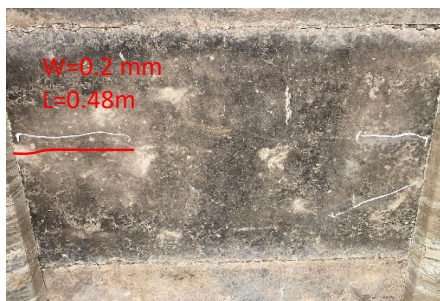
Component	Superstructure	Photo No.	046	Component	Superstructure
